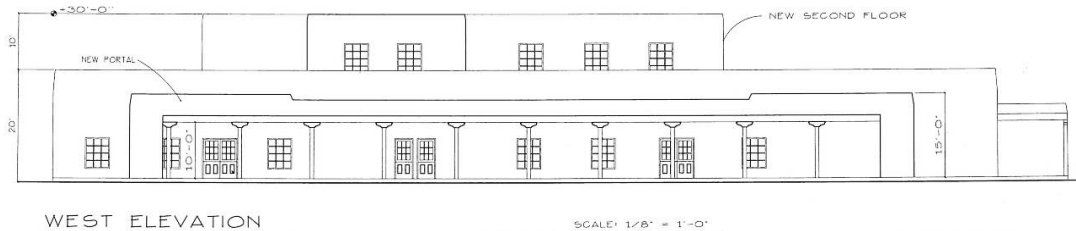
Proposed Pueblo Revival scheme, 1993. Case H-93-111. Creator: Terraplen Architects, Planners, Landscape Architects. Courtesy Terraplen and City of Santa Fe Historic Preservation Division.
